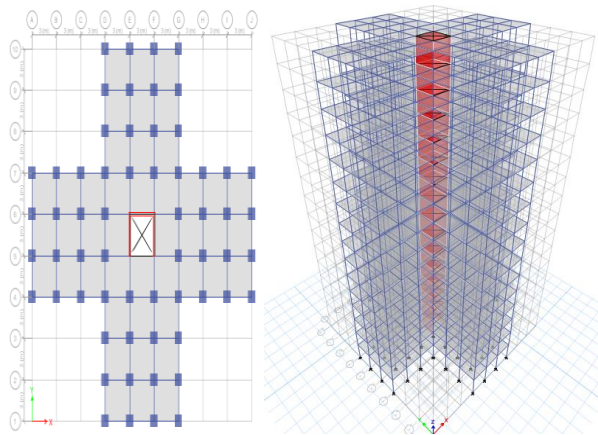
Plan and 3D view of building with shear wall provided at the core (full height of the building)
